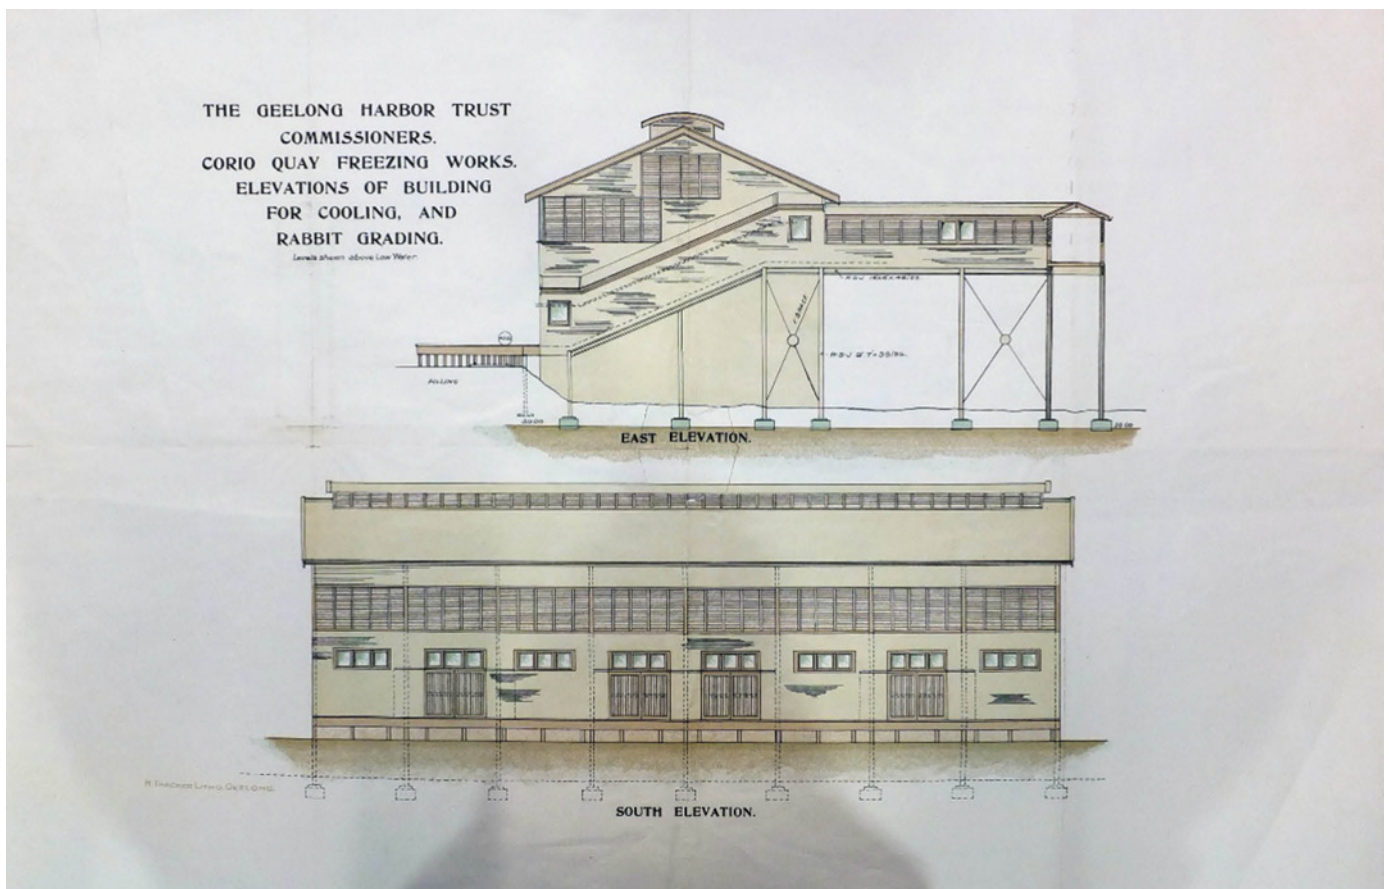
Corio Quay Freezing Works, Elevations of Building for Colling, and Rabbit Grading, The Geelong Harbor Trust Commissioners, 1909. Source: Special Collections, Deakin University Library.
